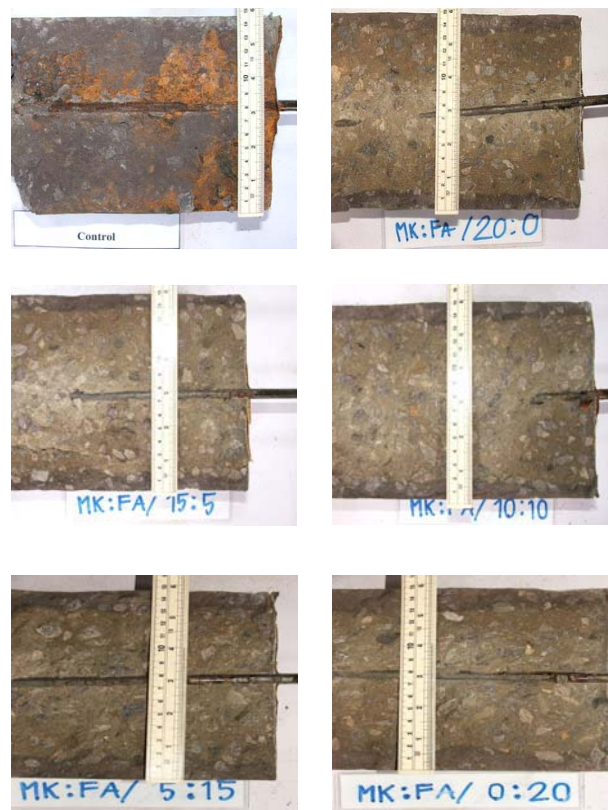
Embedded steel conditions in various concrete type after 90 days of accelerated test
